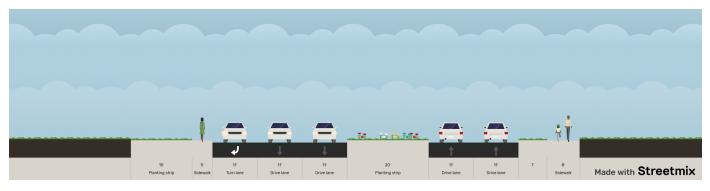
Existing Cross Section of Pecos Street North of 64th Avenue
